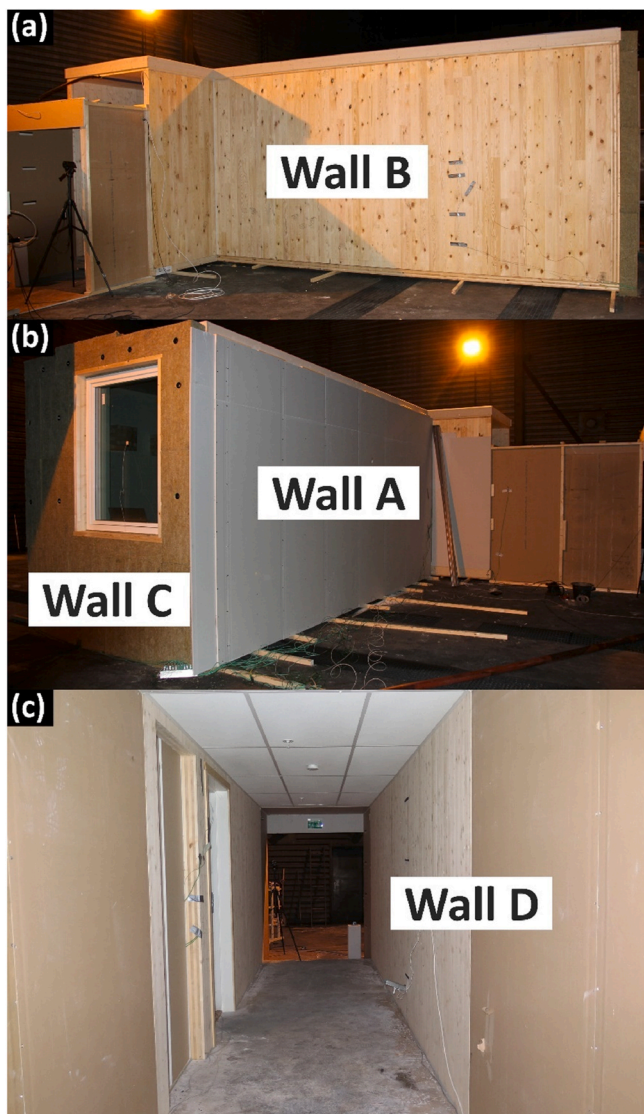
Images of the compartment from the outside (a, b) and corridor (c). The corridor had exposed CLT on parts of the wall and in the ceiling (above the suspended ceiling). Photos by RISE Fire Research.
